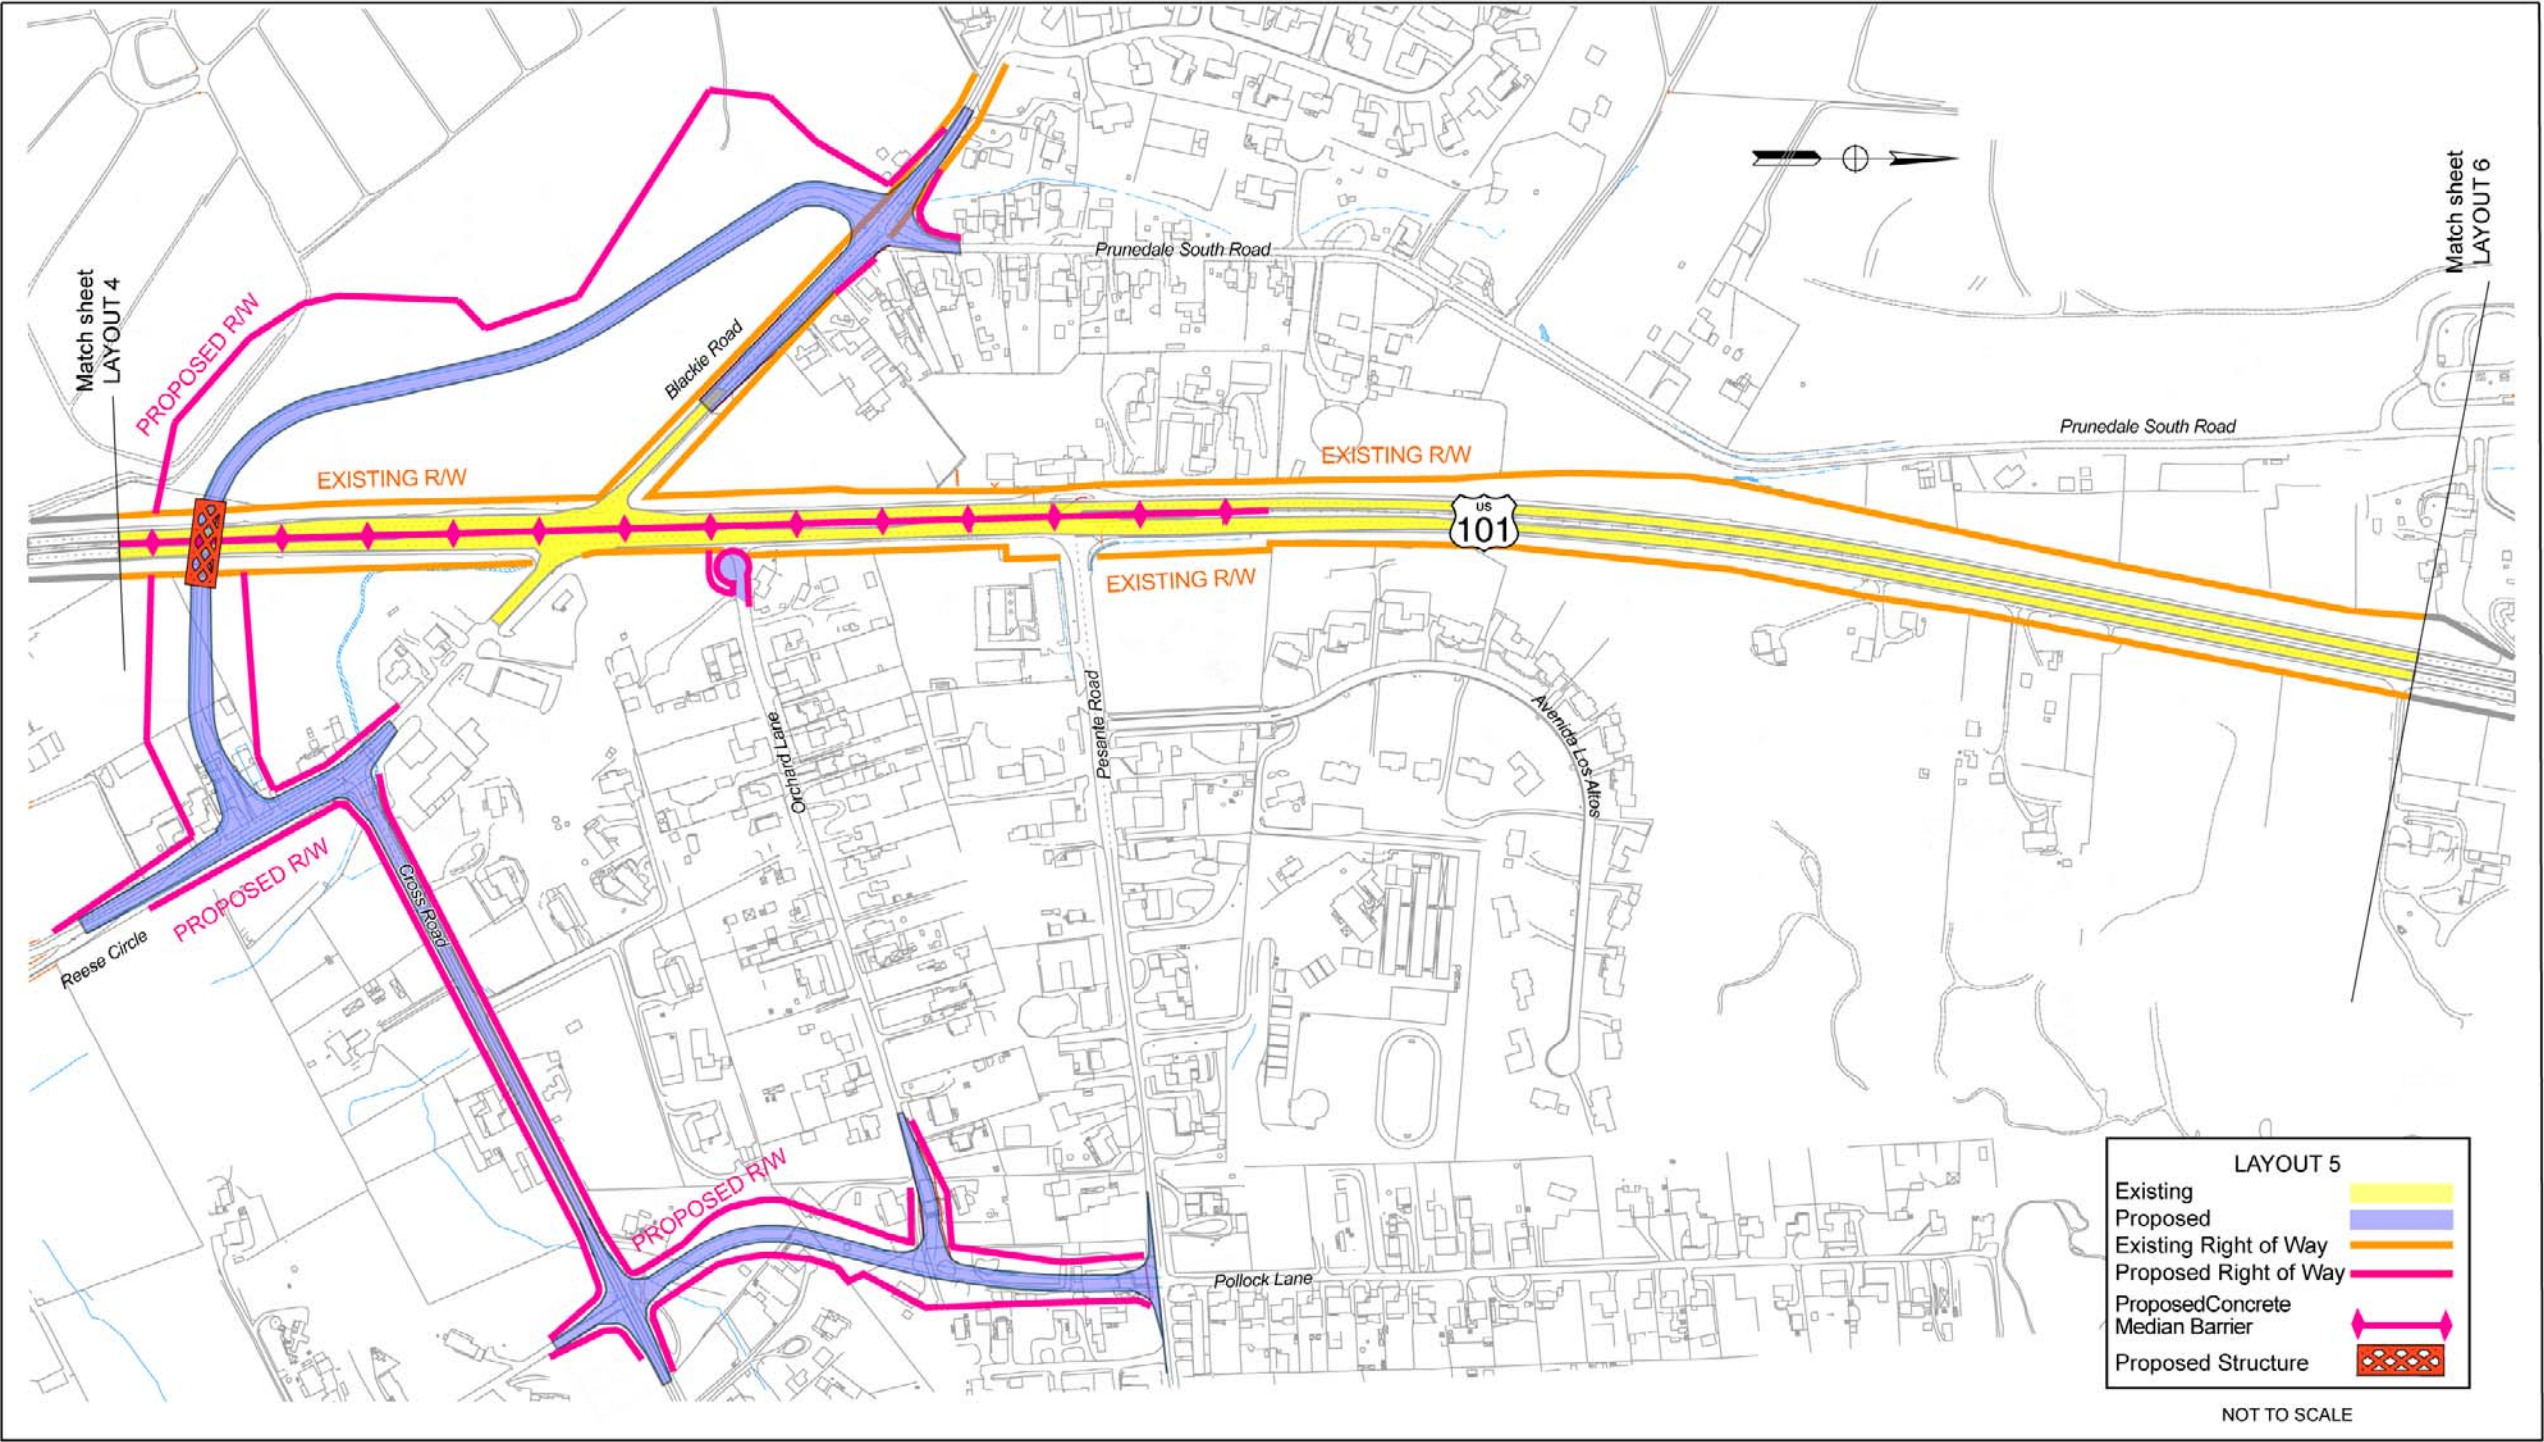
Build Alternative Design, Blackie Road/Reese Circle, Cross Road and Pollock Lane Location
